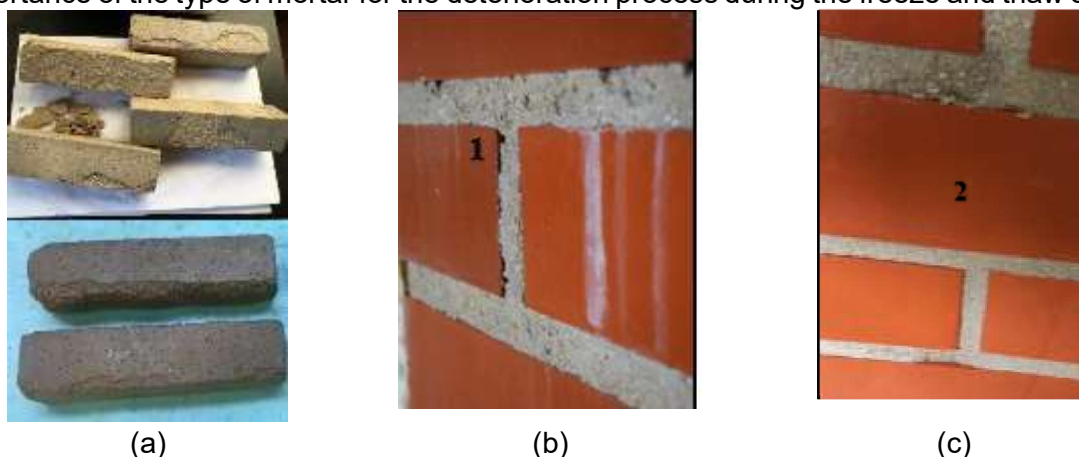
(a) Mortar specimens; (b) brick infill masonry wallet; (c) brick veneer masonry wallet
